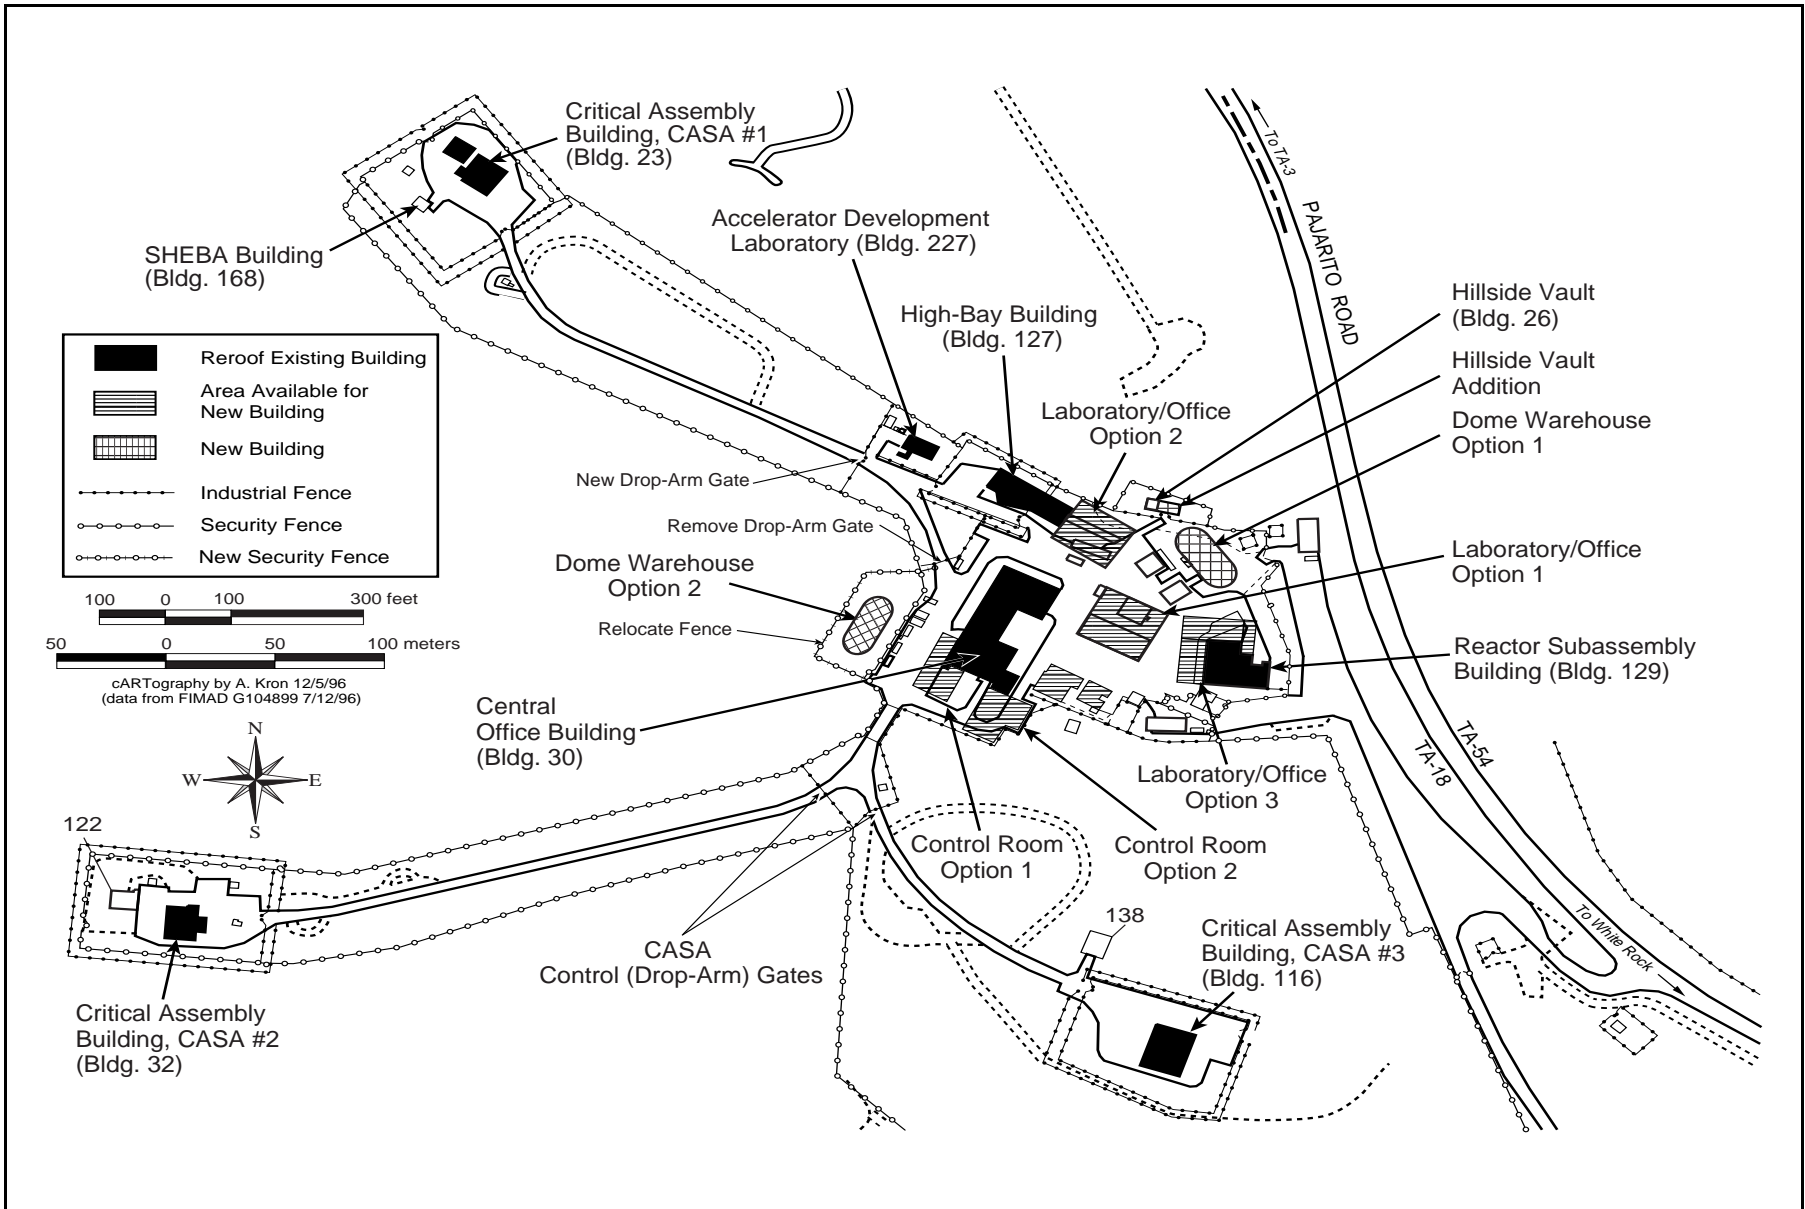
TA-18 Proposed Modifications Plan (TA-18 Upgrade Alternative)
